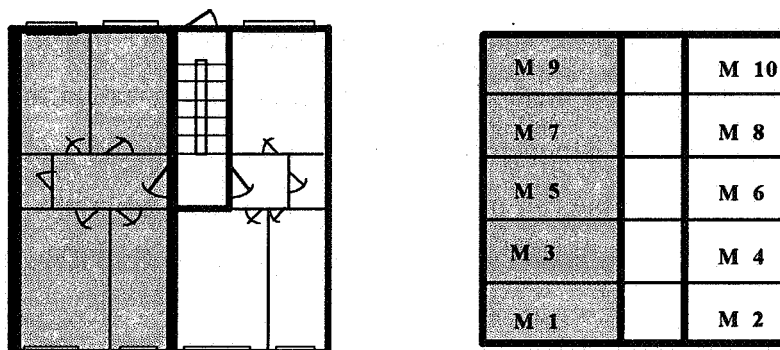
Inside structure of a building (floor plane and sciagraph)
